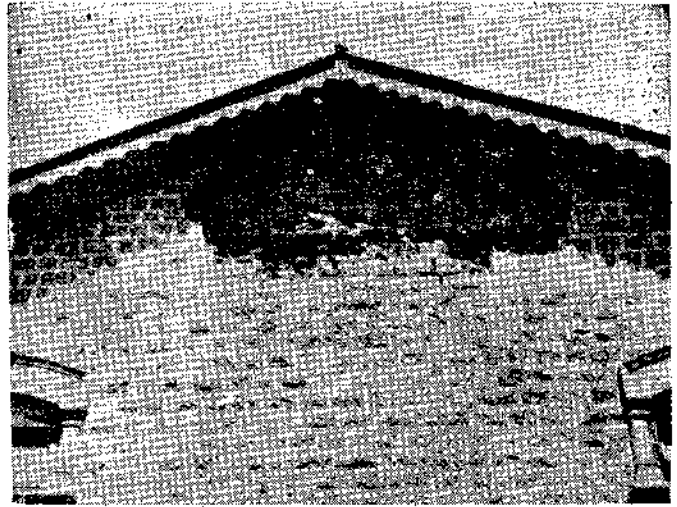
Damaged Gable End of the Government College Building in Khanabal, showing the use of Horizontal Timber Planks in the Walls.
